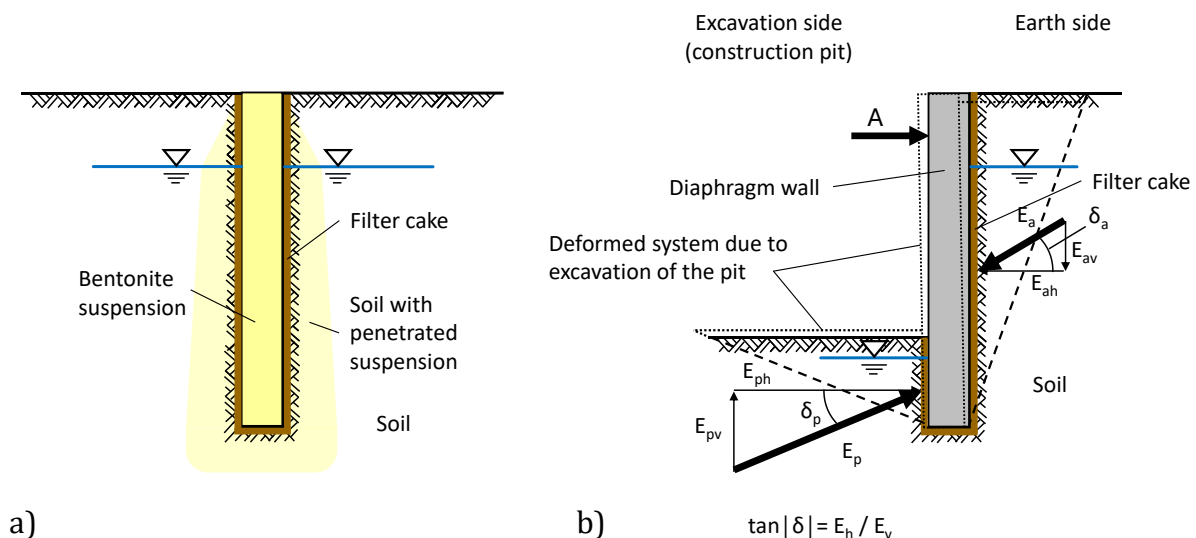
Filter cake location and wall friction angle at diaphragm walls a) open trench supported by bentonite suspension and b) hardened diaphragm wall after excavation of construction pit; simplified cross sections
